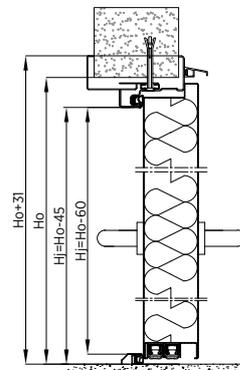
Installation of the single-leaf door to a masonry wall - wrap-around frame with a thermal break - vertical cross-section
